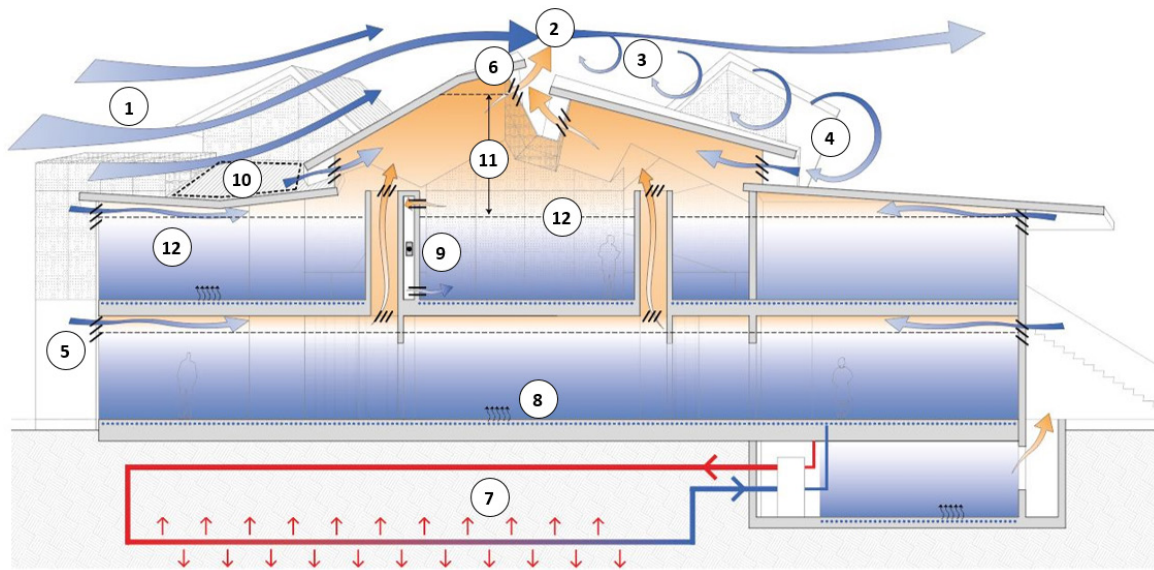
Concept for the main house: 1- WSW prevailing wind; 2- low pressure zone; 3- high pressure zone; 4- recirculating airflow; 5- natural wind ventilation (17 m²); 6- wind scoop – solar chimney (8 m²); 7- geothermal system (9 geothermal boreholes 100 m deep); 8- radiant floor; 9- gravity wall; 10- PV and solar thermal; 11- heat reservoir; 12- warm buffer – cold air zone boundary;
